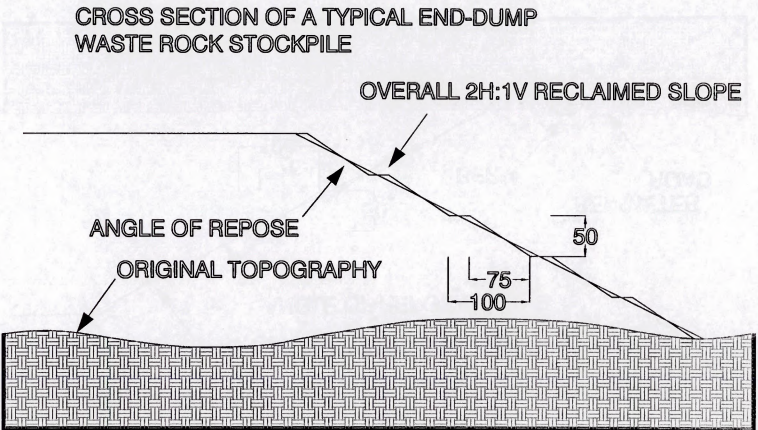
Cross Section of Typical End-Dump Waste Rock Stockpile
